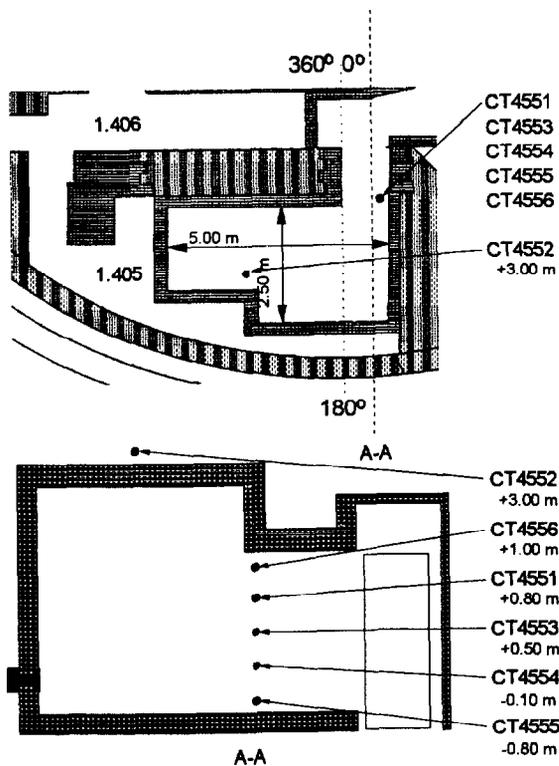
Fire Room Vertical Cross-Section for T51.19
